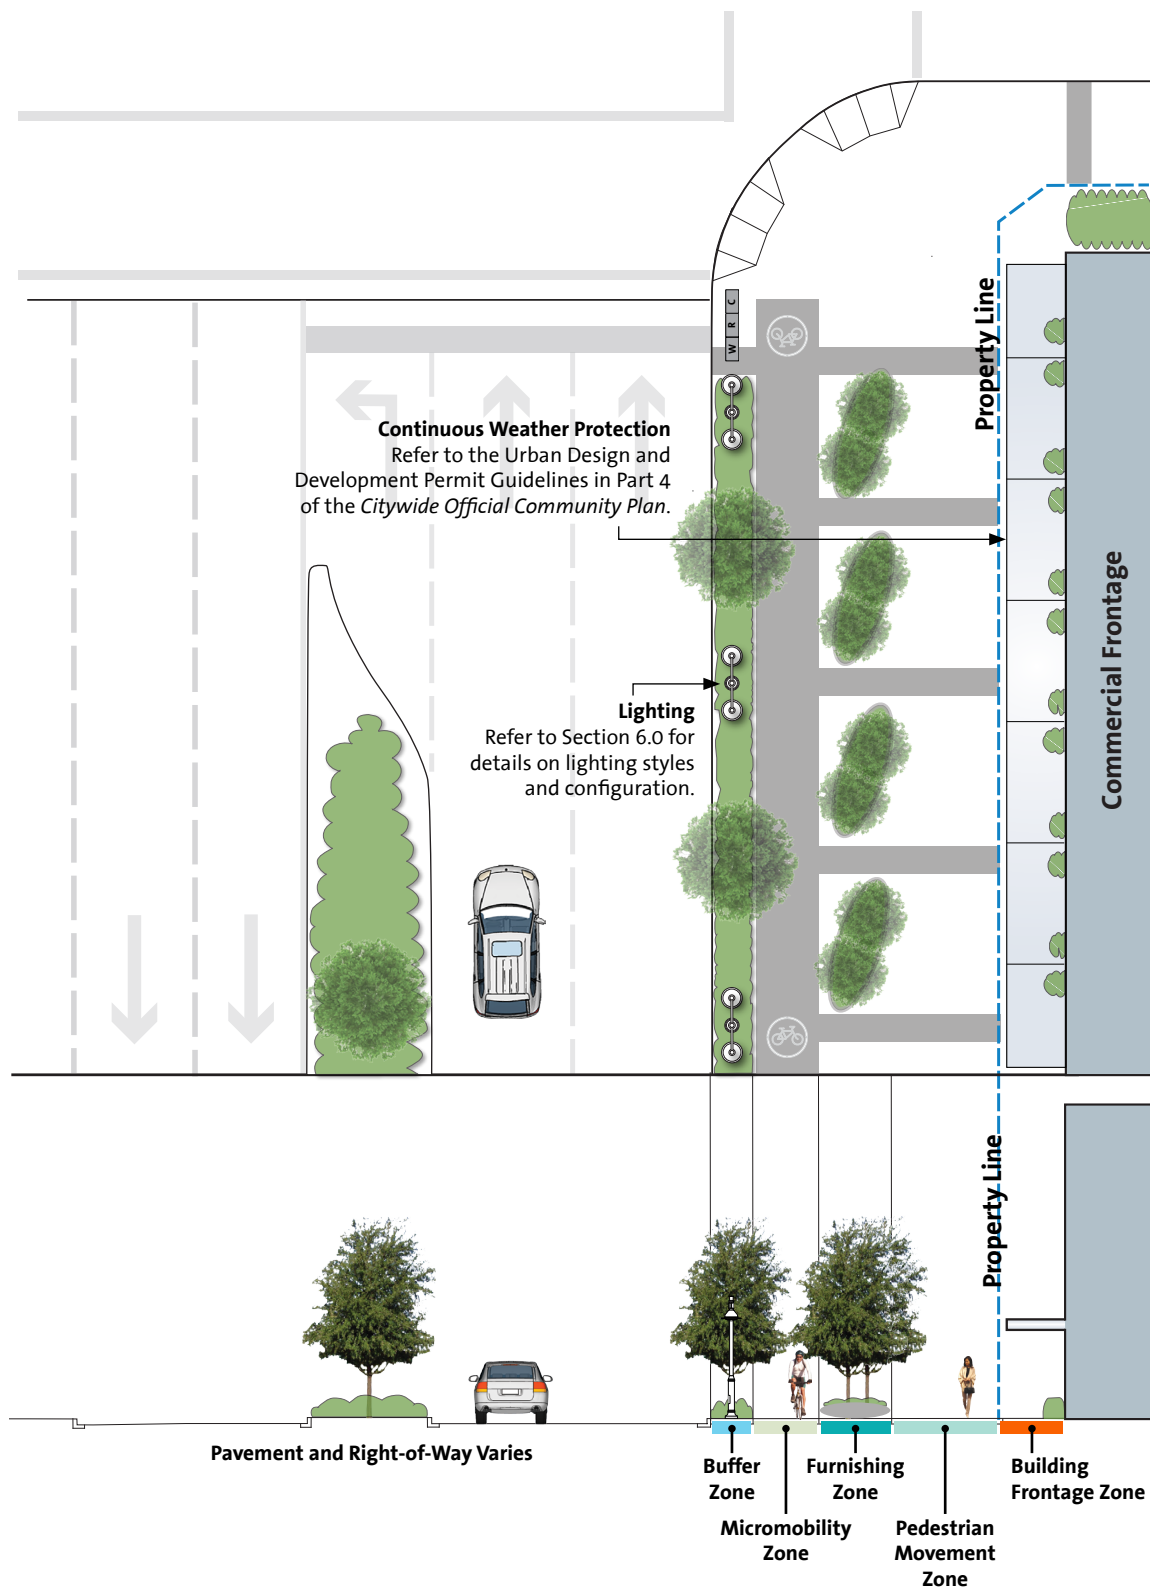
Plan View and Cross-Section of the Pinetree Way Character Street.
